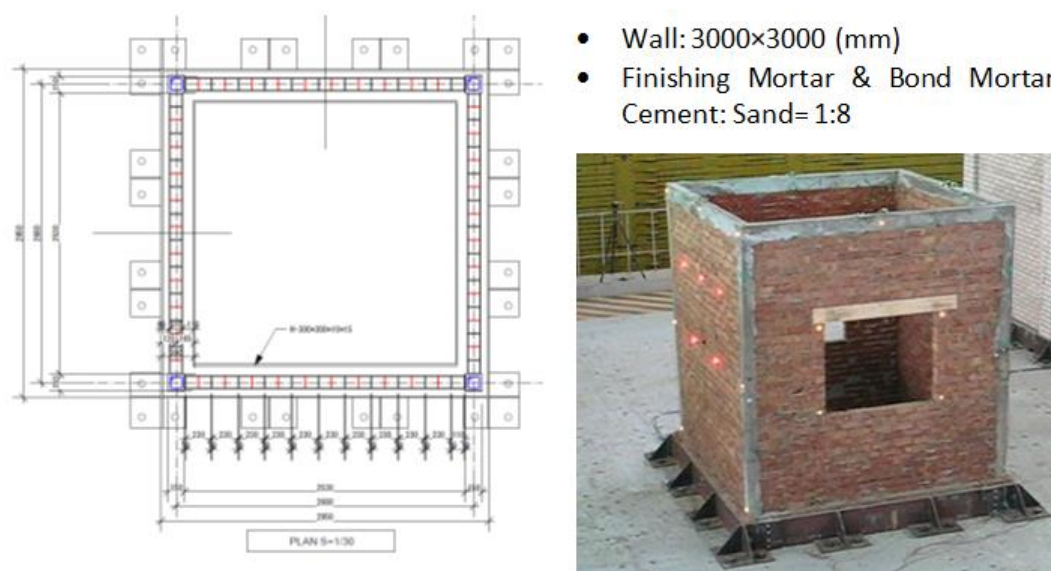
Outline of Model Structure for Shaking Table Test of Confined Masonry Brick-Walls Construction (National Research Institute for Earth Science and Disaster Prevention (NIED), 2008)
